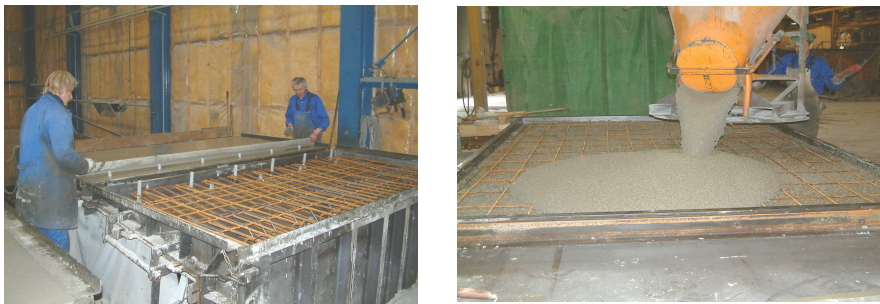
Example of a horizontal casting, finishing (left) and filling (right) [Ib Lauridsen et al., G].
